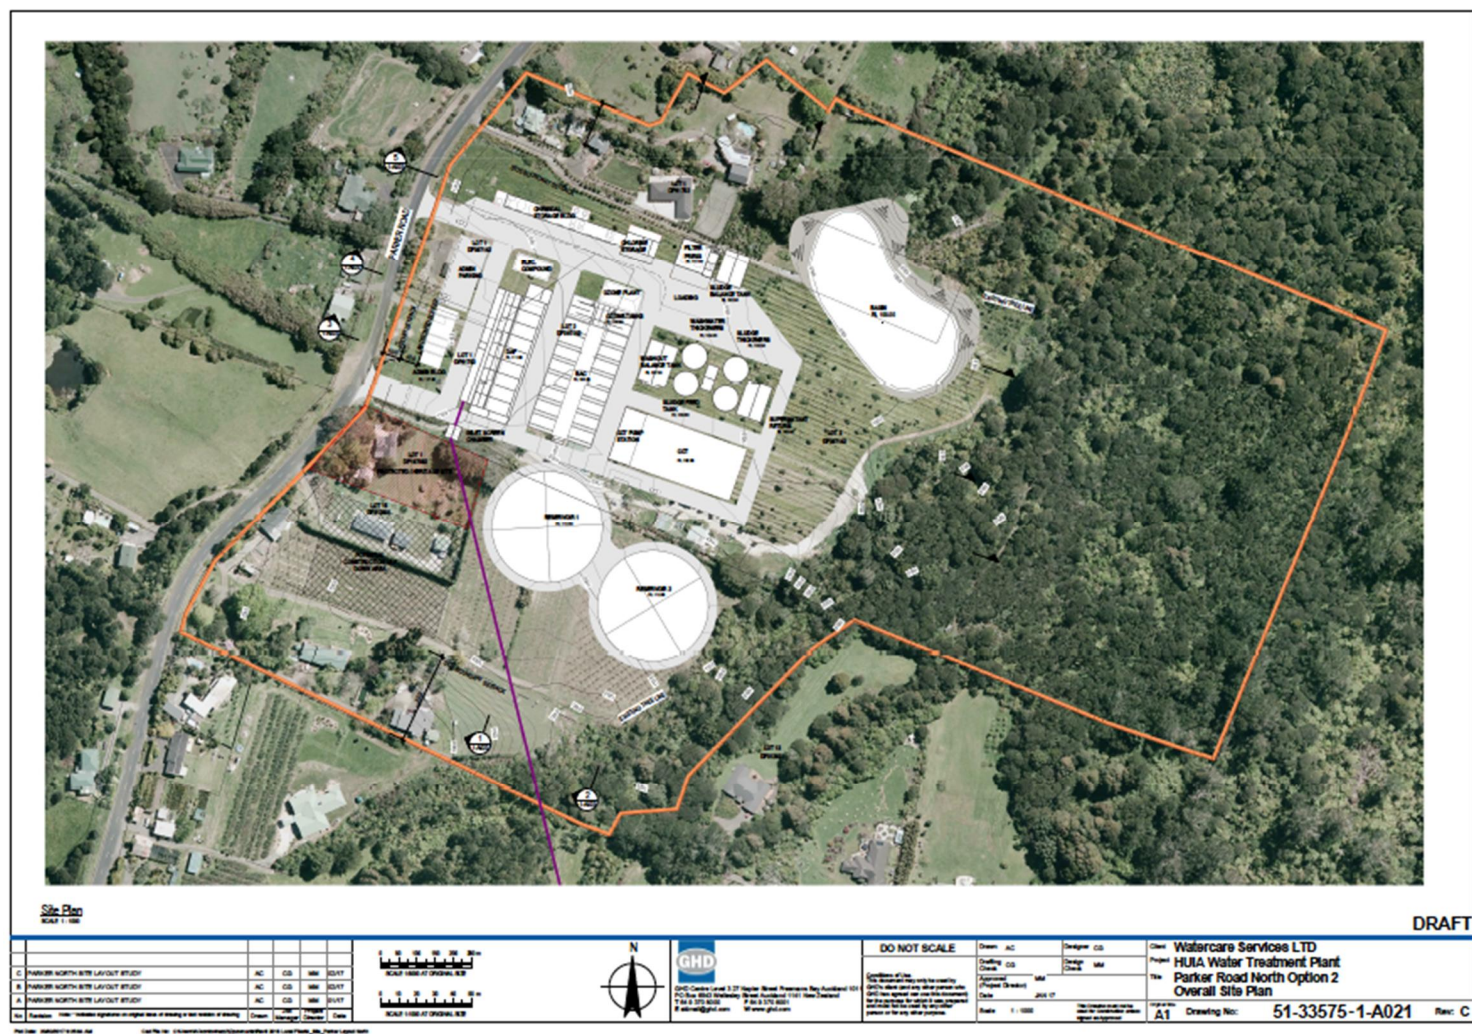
Parker Road North WTP option, Parker Road, Oratia (source: GHD)
